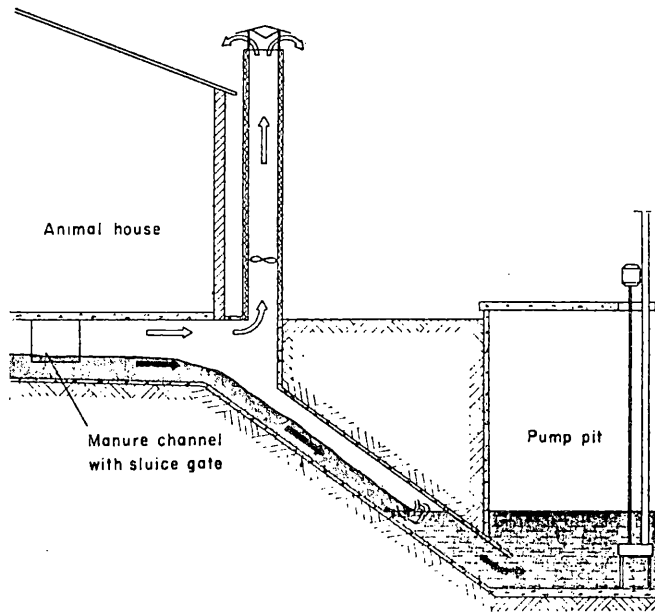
Example of how it is advisable to arrange evacuation of the cleaning-out culvert when building a new installation with sluice gate system.
